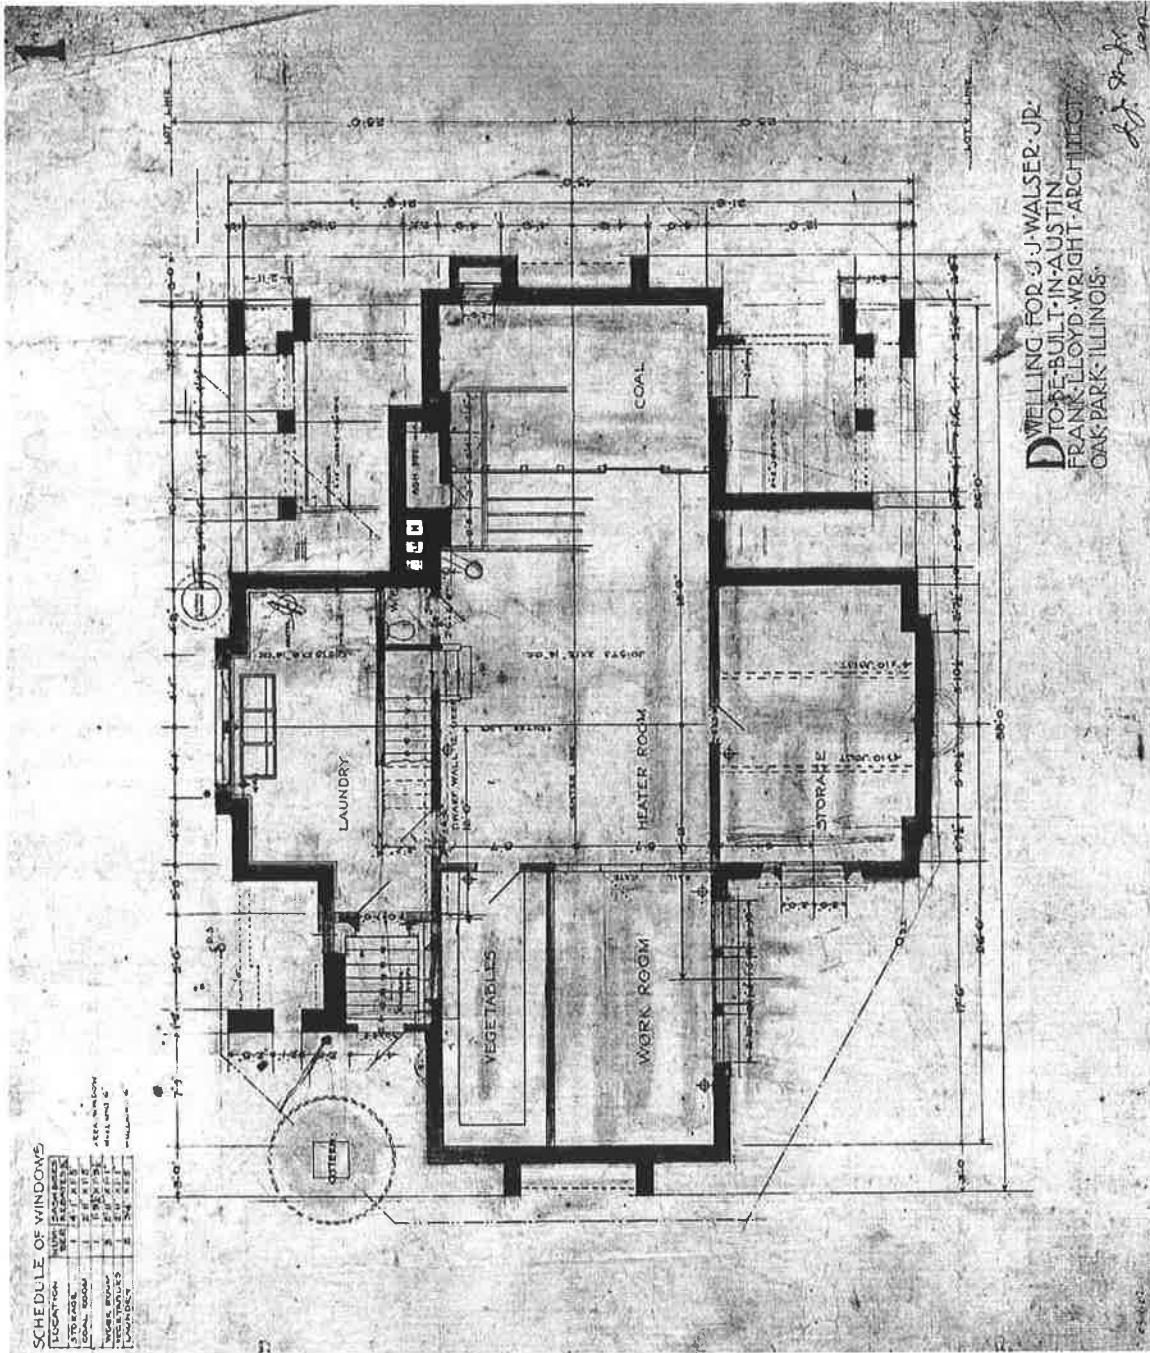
Original 1903 Joseph J. Walser House basement floor plan
